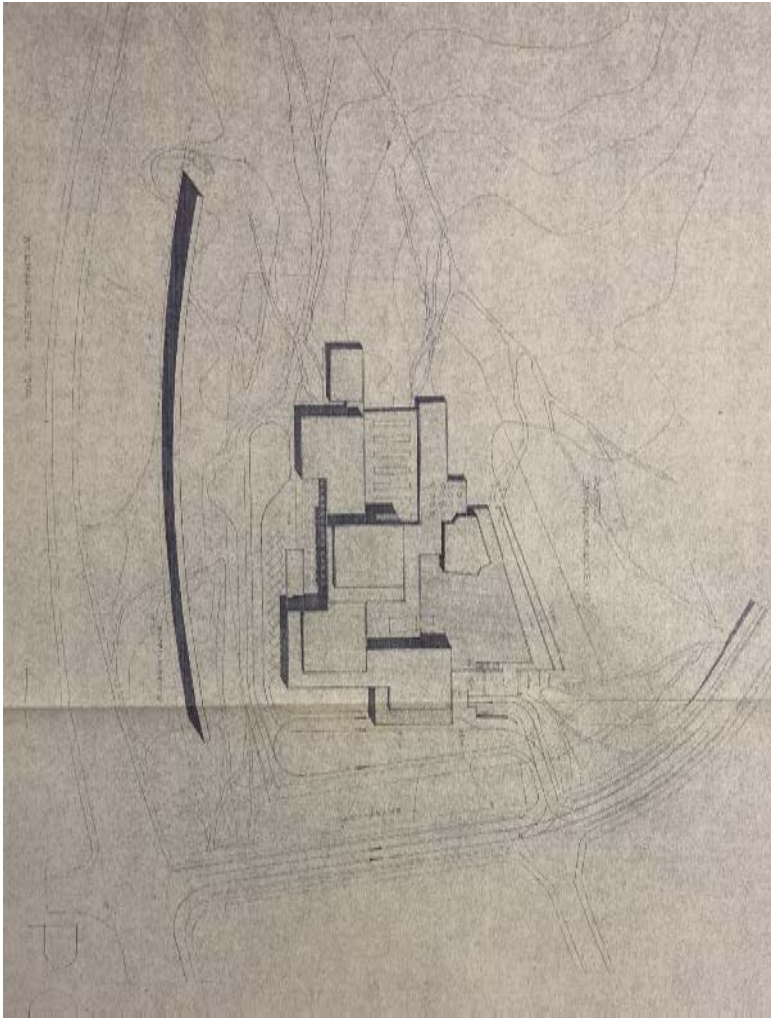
Alvar Aalto, Maiandros (Stage 1): Site Plan Oriented North Upwards
